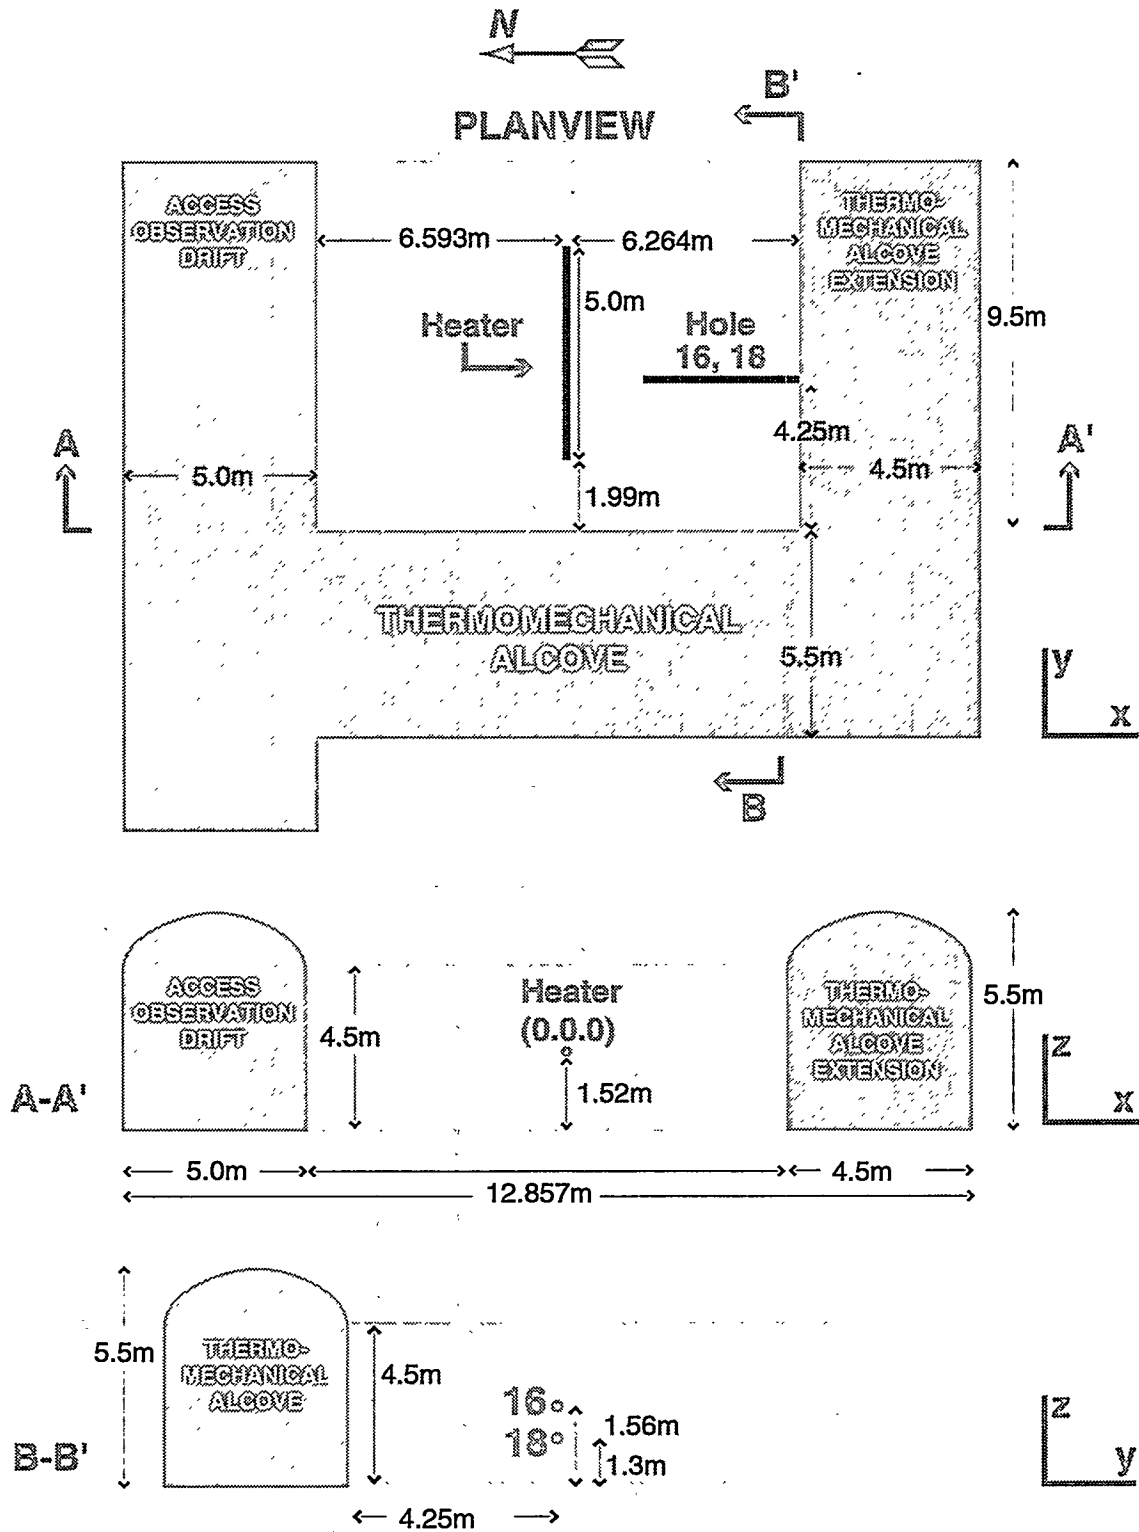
Layout and configuration of the Single Heater Test with dimensions.
